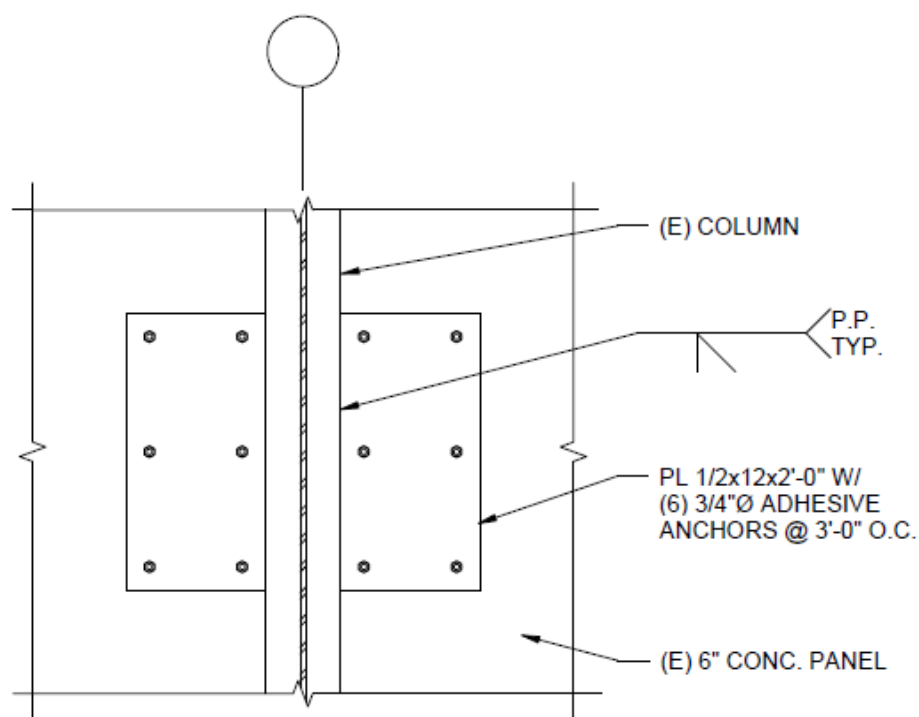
Precast Panel-Panel Connection Strengthening (Interior Face)
